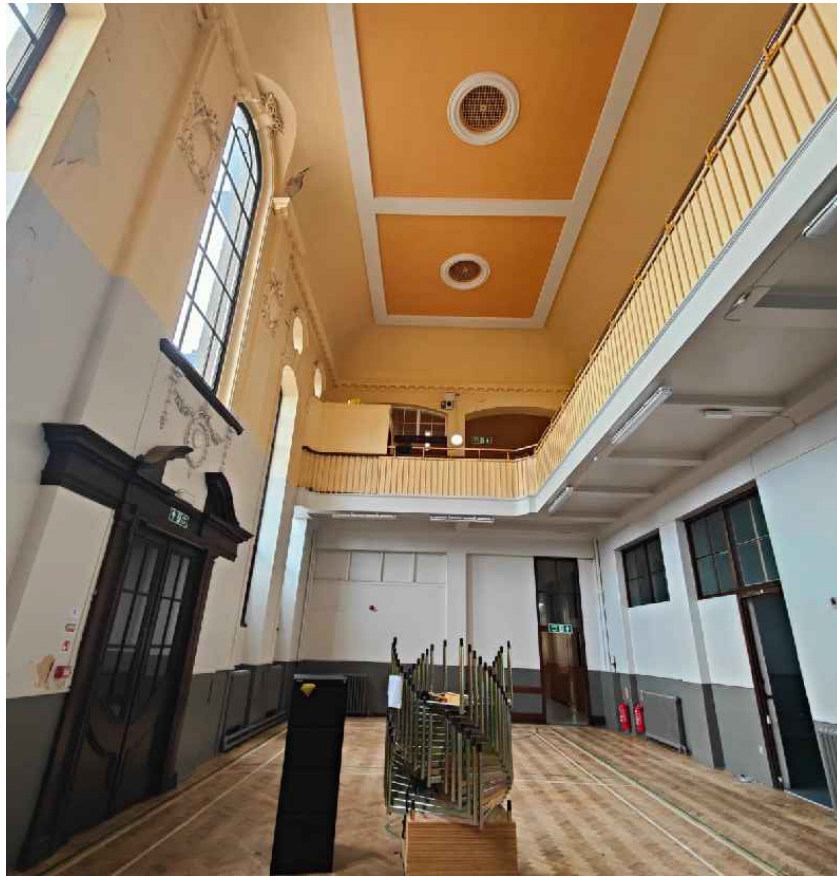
Ceiling of Room 0/9 showing ventilation grilles and moulding (© Trail Architects 2024)
